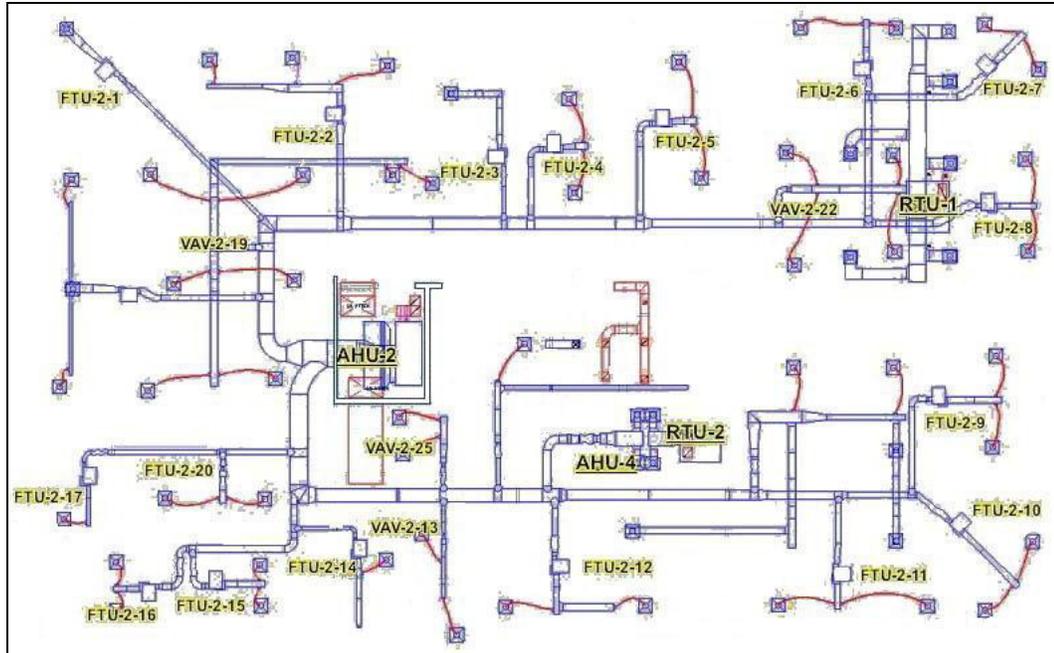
Second floor duct layout consisting of 25 VAV boxes.
